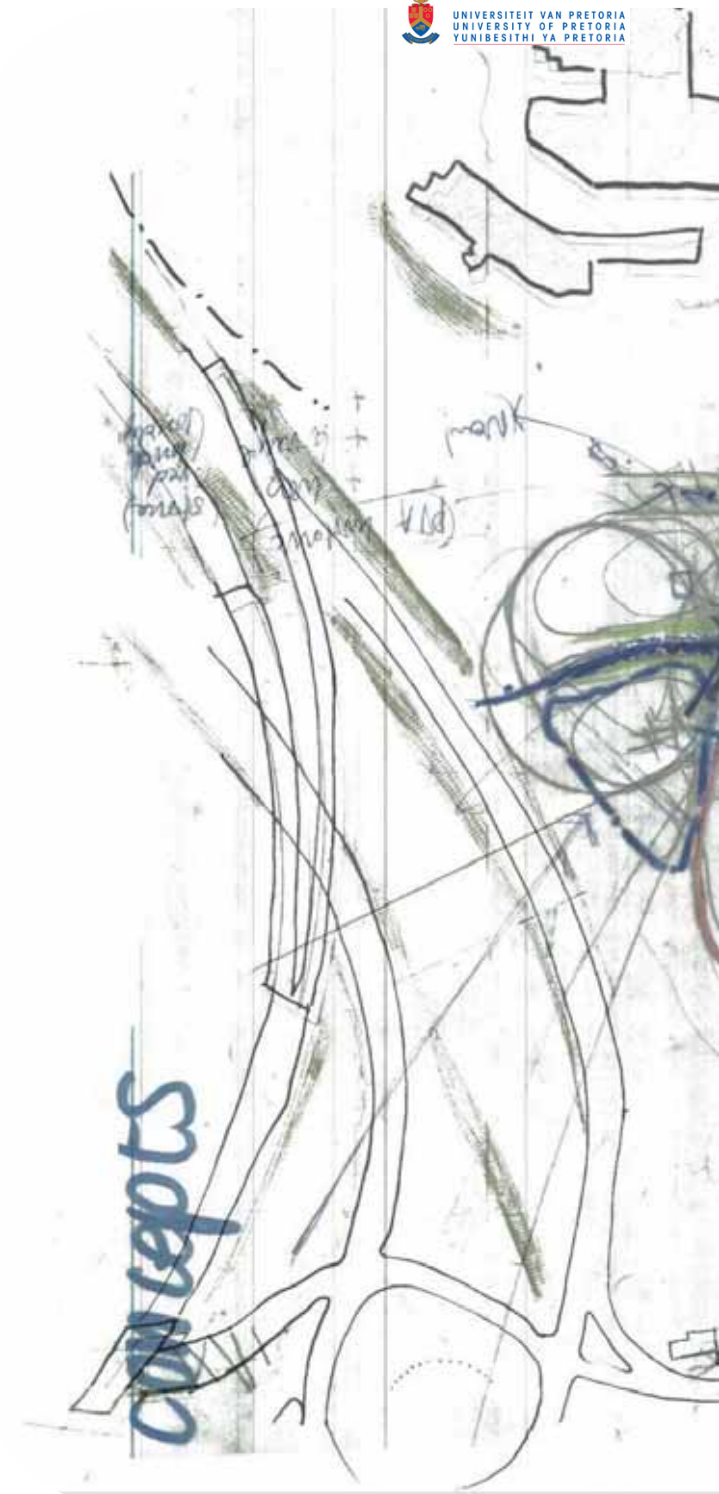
was the first concept site layout. The existing facilities, slope and open spaces were drawn. In Figure 149 large volumes of stormwater are dammed onsite, pedestrian circulation is considered, the HPC was placed onsite and a new entrance implemented.
